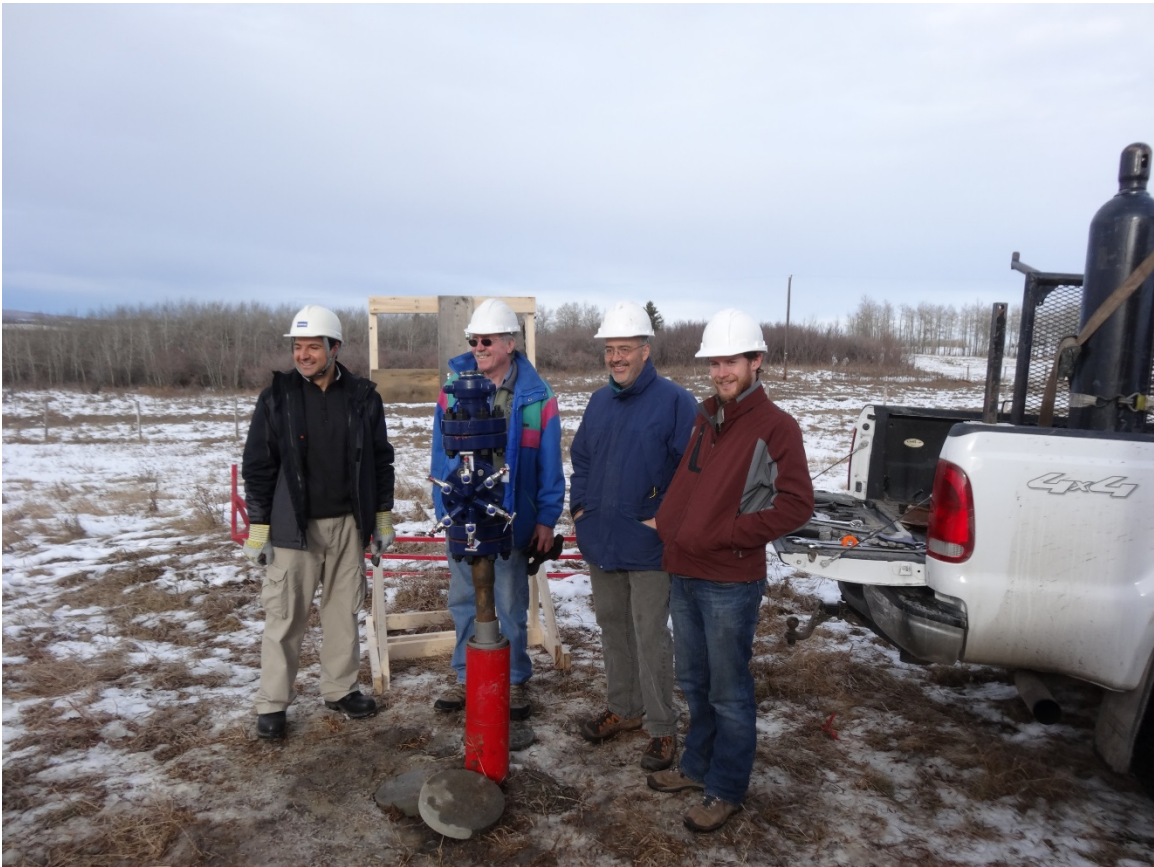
The completed wellhead structure on Well 4 at the Priddis Geophysical Observatory
